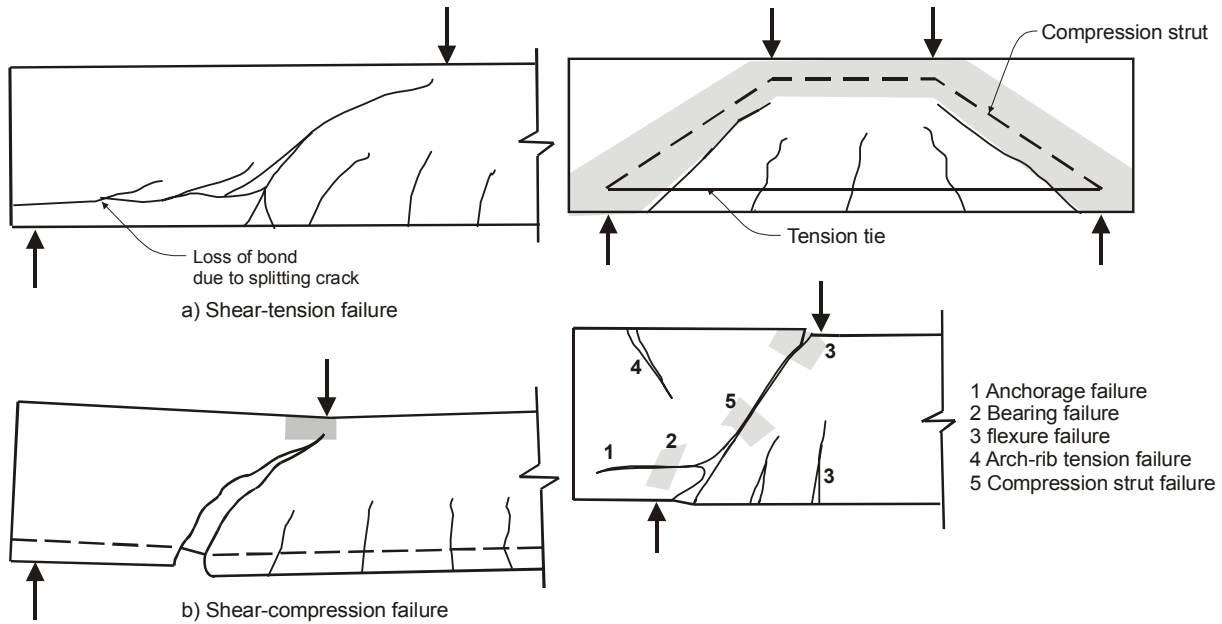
Modes of Shear Failures in Short Beams (ASCE-ACI 426, 1973)
